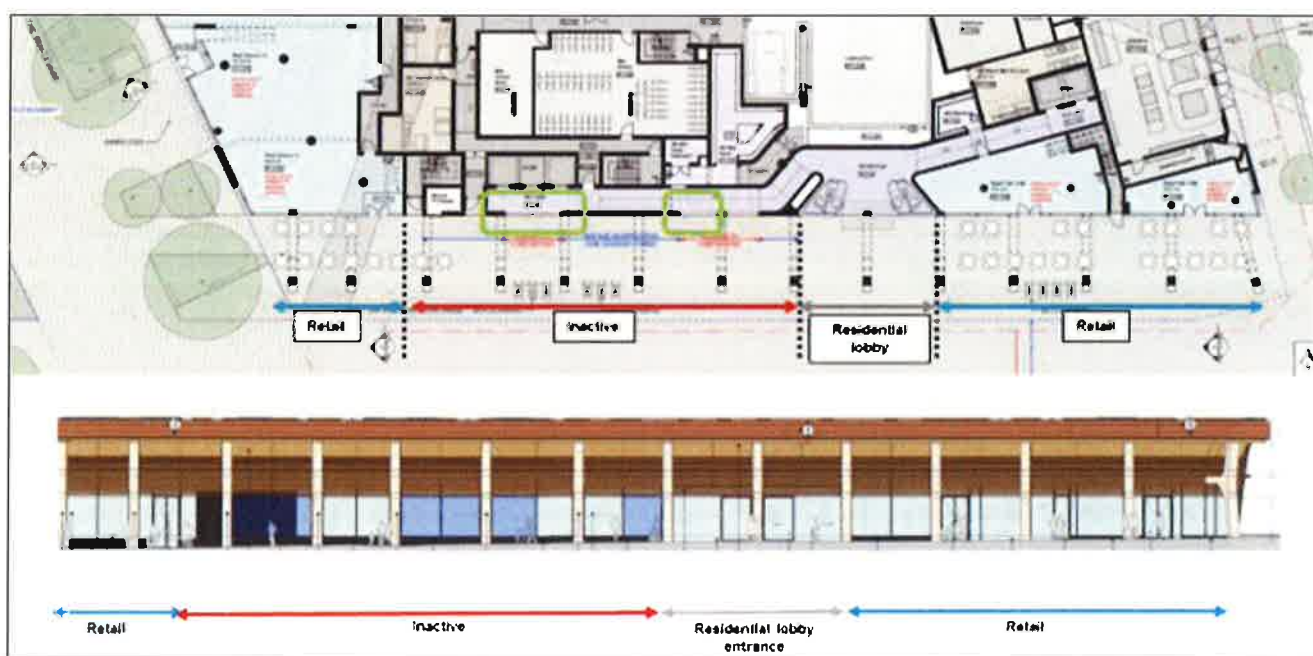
The original ground floor level undercroft layout and elevation including the location of proposed uses and inactive areas, additional windows inserted by applicant outlined in green (Base source: Applicant's RtS)
